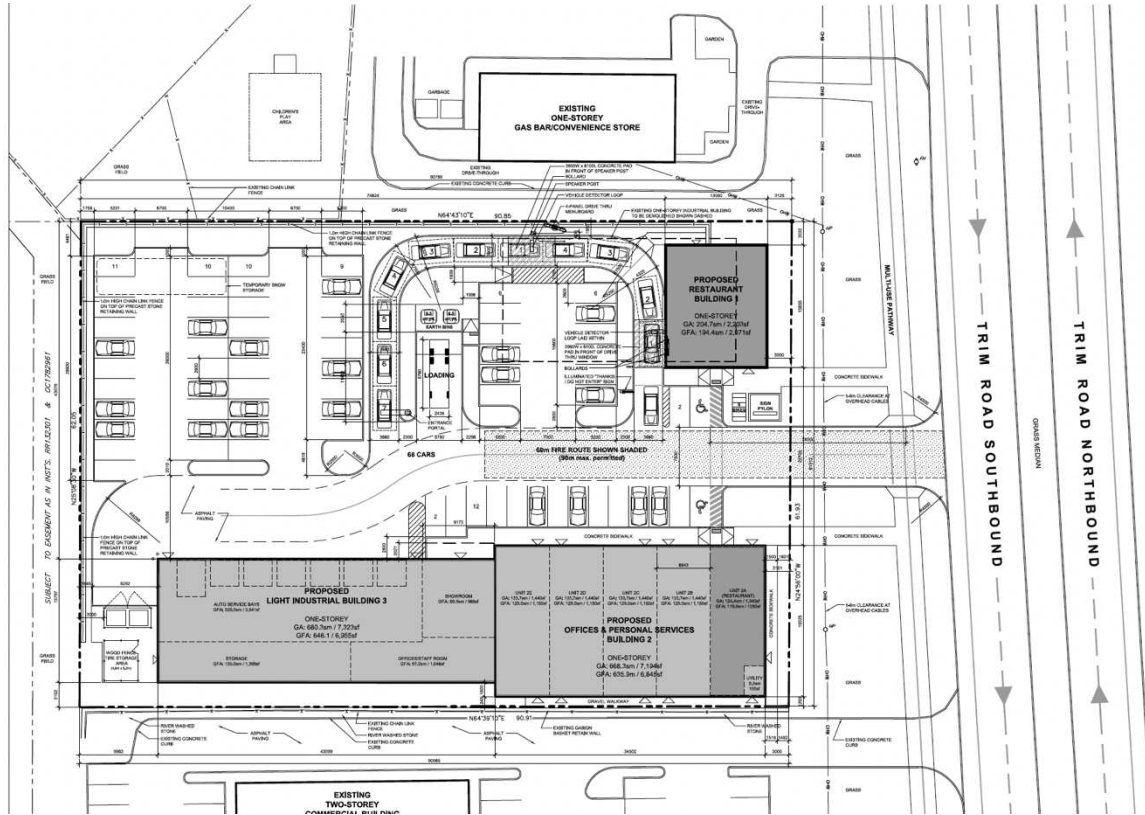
Extract of Site Plan (Source: McRobie Architects & Interior Designers)
